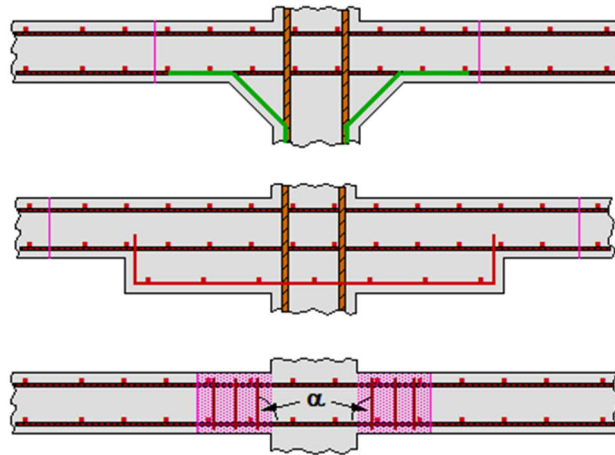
Punching shear reinforcement: column capital (top); drop panel (middle); shear links (bottom); (The Concrete Centre, 2017)
